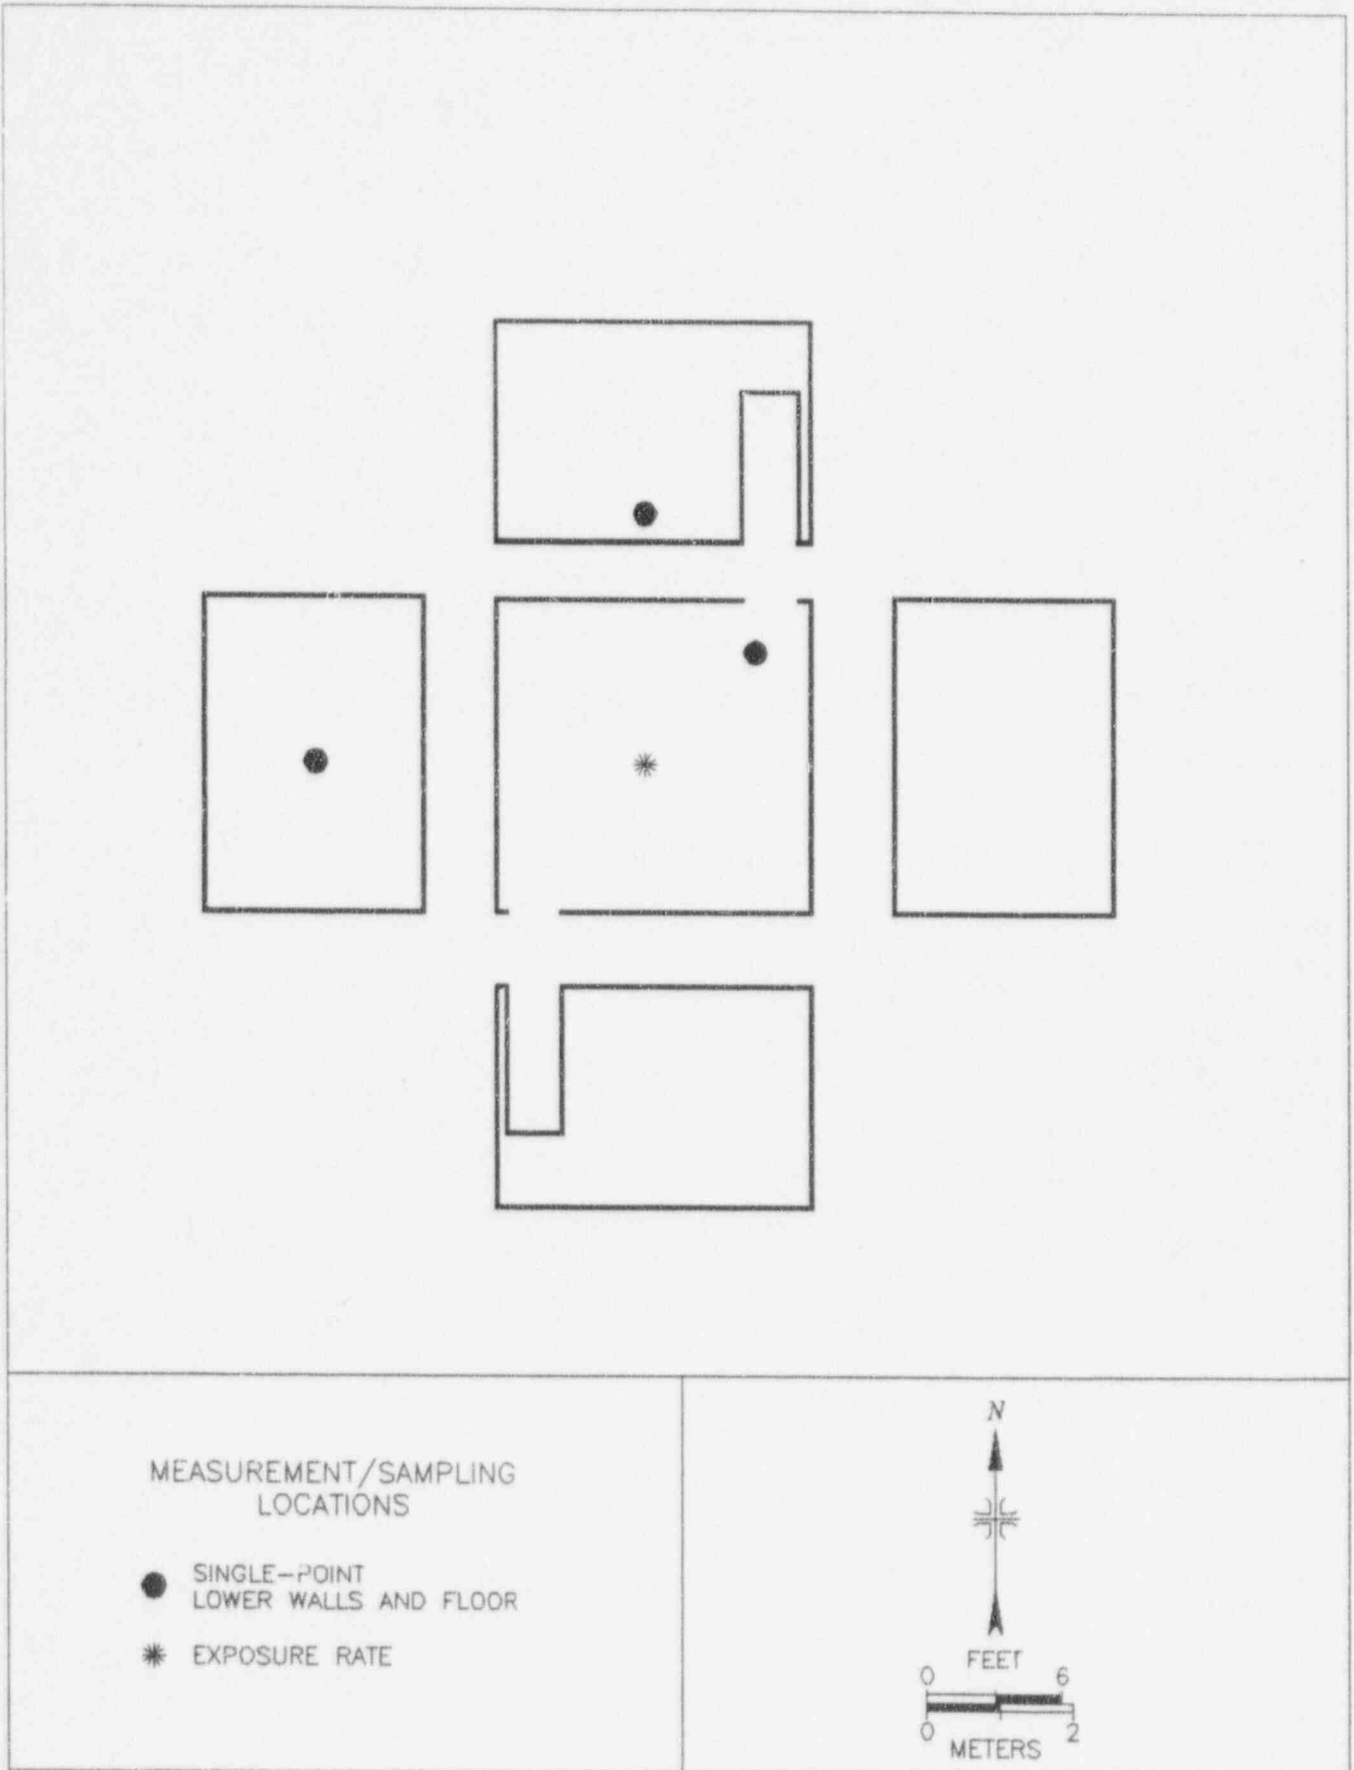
Building 1, Room 2 - Measurement and Sampling Locations
